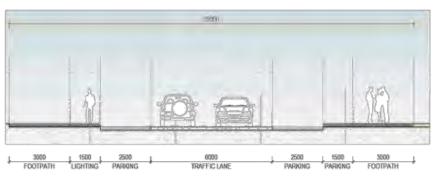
20m Wide Streets - Typical Section (Source: Ryde DCP 2014)
